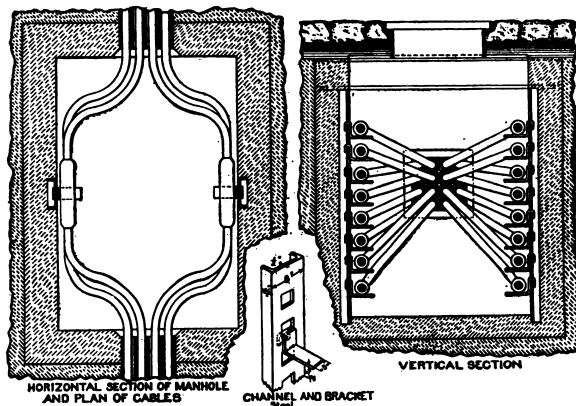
CABLE RACKING IN MANHOLES.
